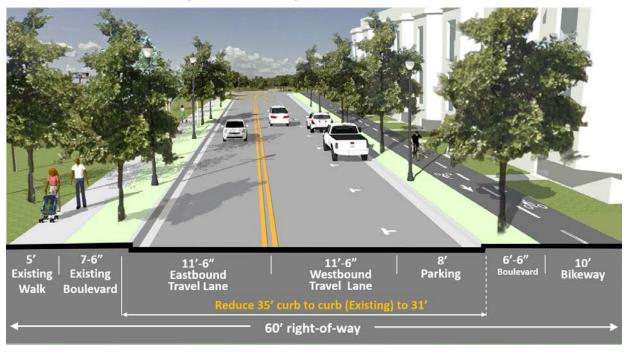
3RD STREET N. (LOOKING WEST)
